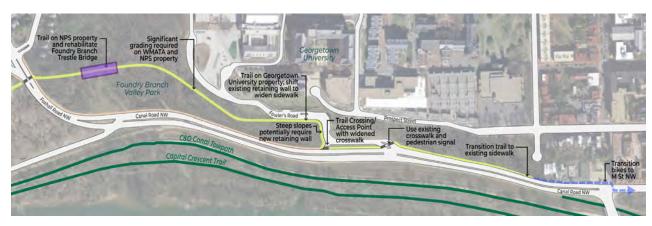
Option 3 - Foundry Branch Trolley Trestle Bridge to Fowler Road to Canal Road
